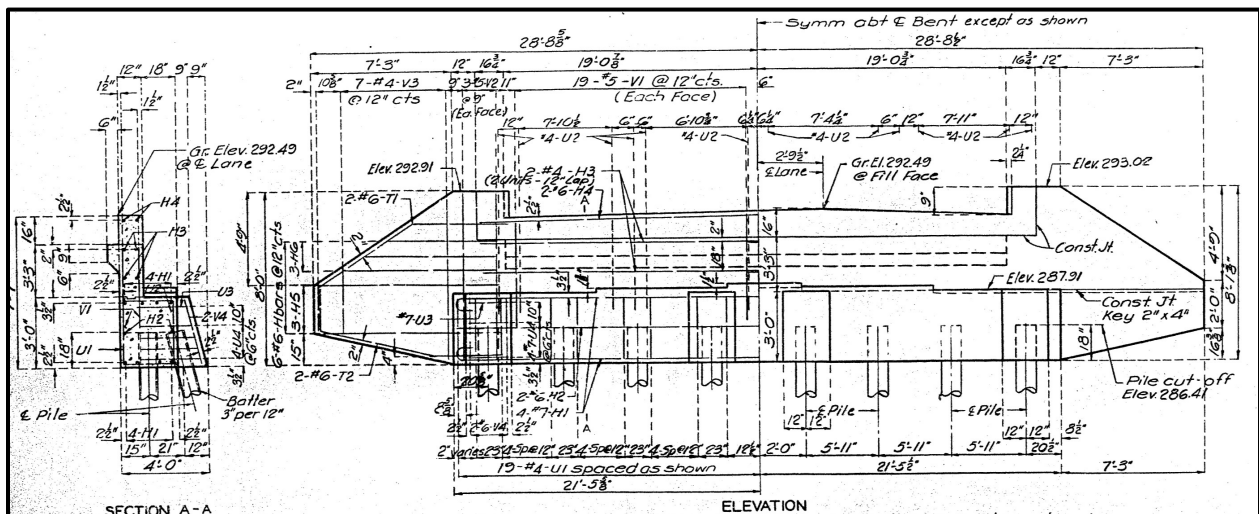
Abutment Details of the A1466 Bridge (supported by eight piles)
